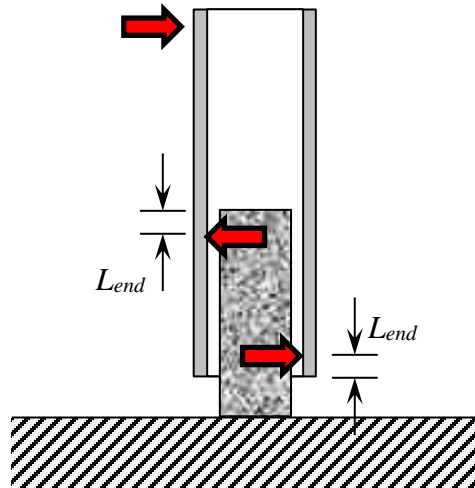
Model adopted for distribution of moment between plug and pile-column wall.
